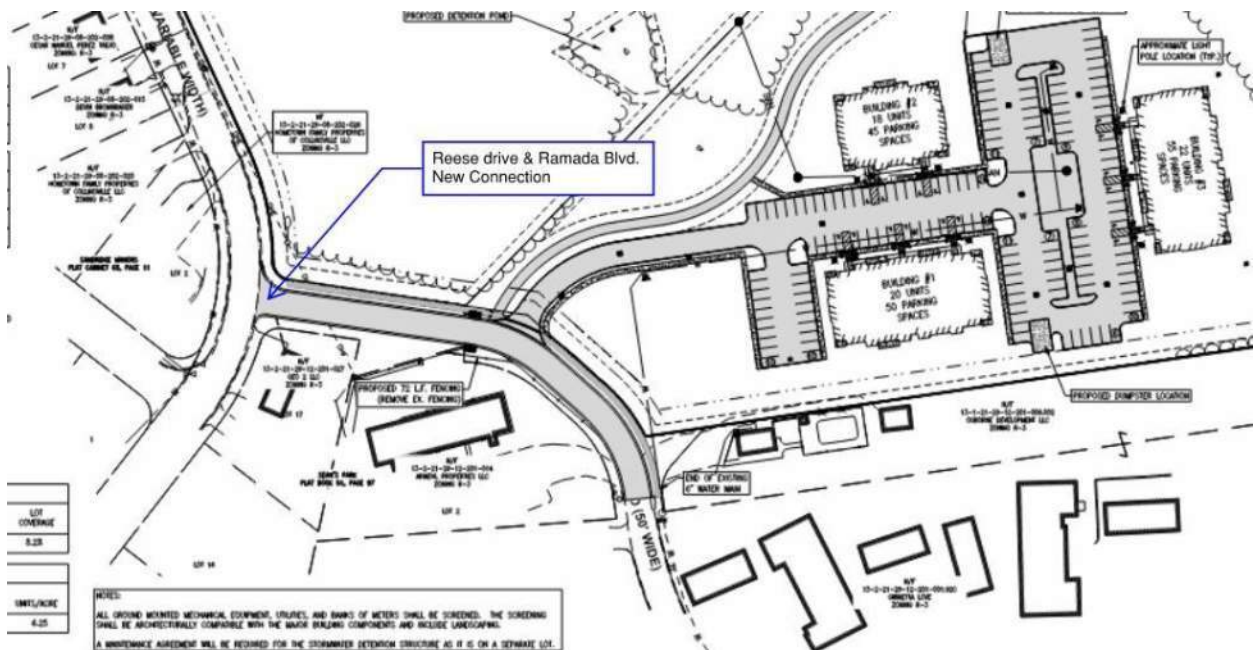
Reese Dr. and Ramada Blvd. New Connection
